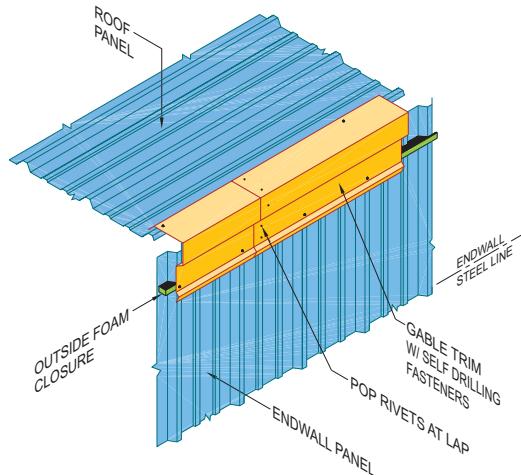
GABLE TRIM WITH EAVE TRIM
